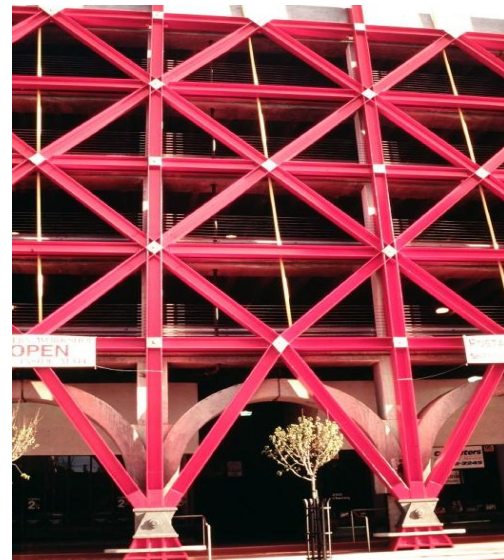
Steel bracing structure for upgrading a multi-storey auto-silos in Berkeley.
